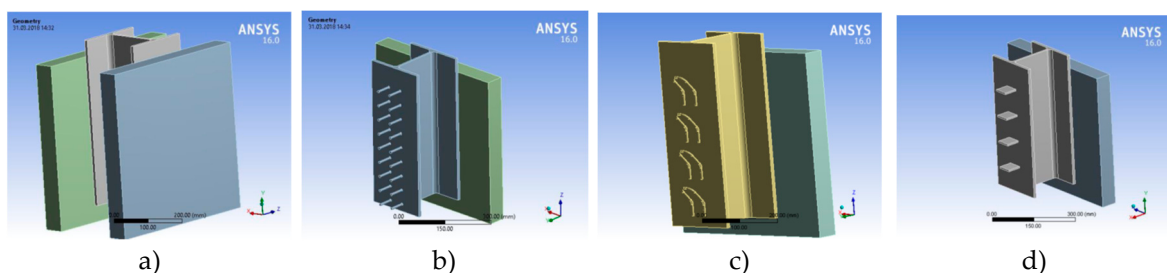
a) General view of the prism model; b) shear stud bonds from reinforcing bars; c) anchors from loop-shaped collars; d) shear studs bond from steel plates.
